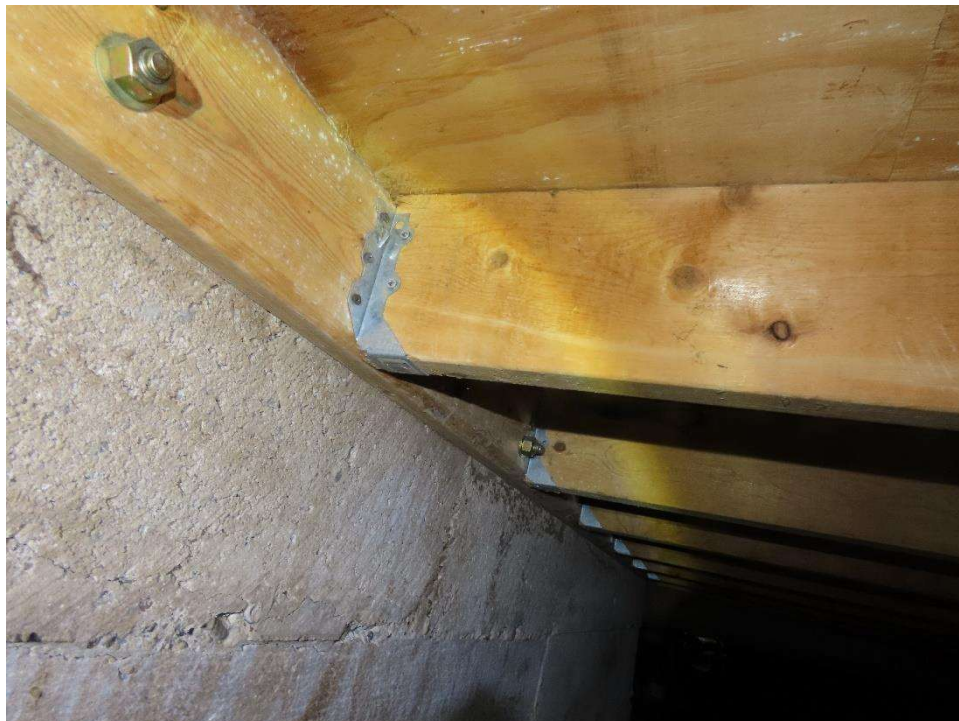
Newer wood framing and metal joist hangers on the ceiling of the crawlspace (the floor framing for the interior above).
